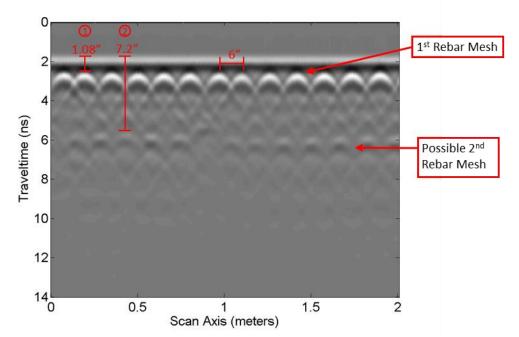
GPR Image (File 139), corresponds to a GPR scan on Area 3 on Bridge 77. Parallel to steel bridge deck girder.
